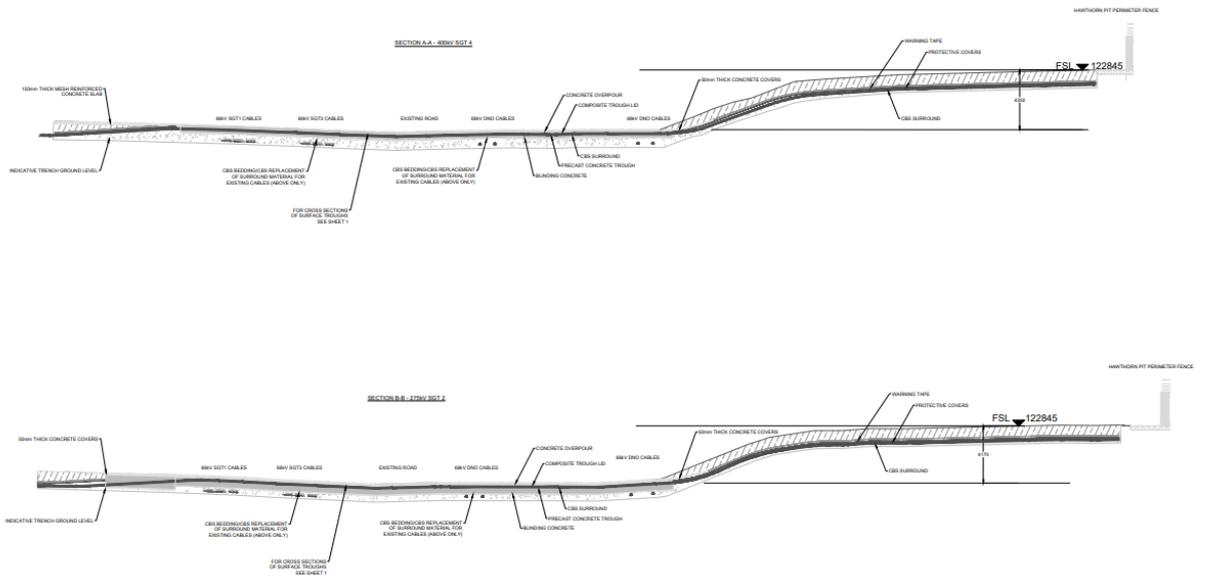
Cross section of HVAC cables from Substation across existing substation access road.
